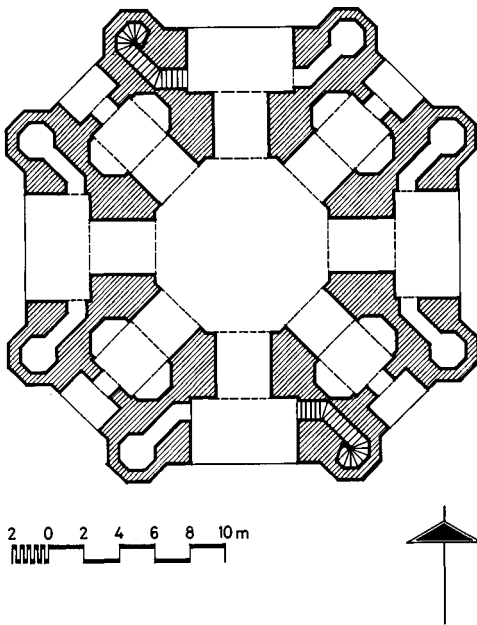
Lahore, tomb "of Anārkalī", 1024/1615. Reconstructed ground plan.
